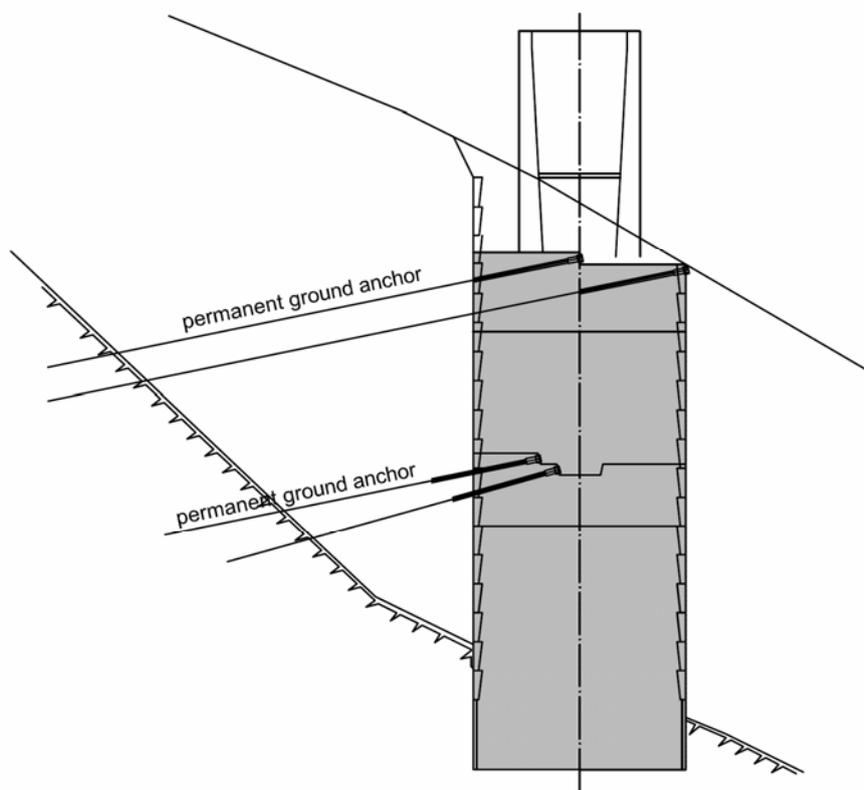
Example of anchoring a well; anchorages located at several levels
